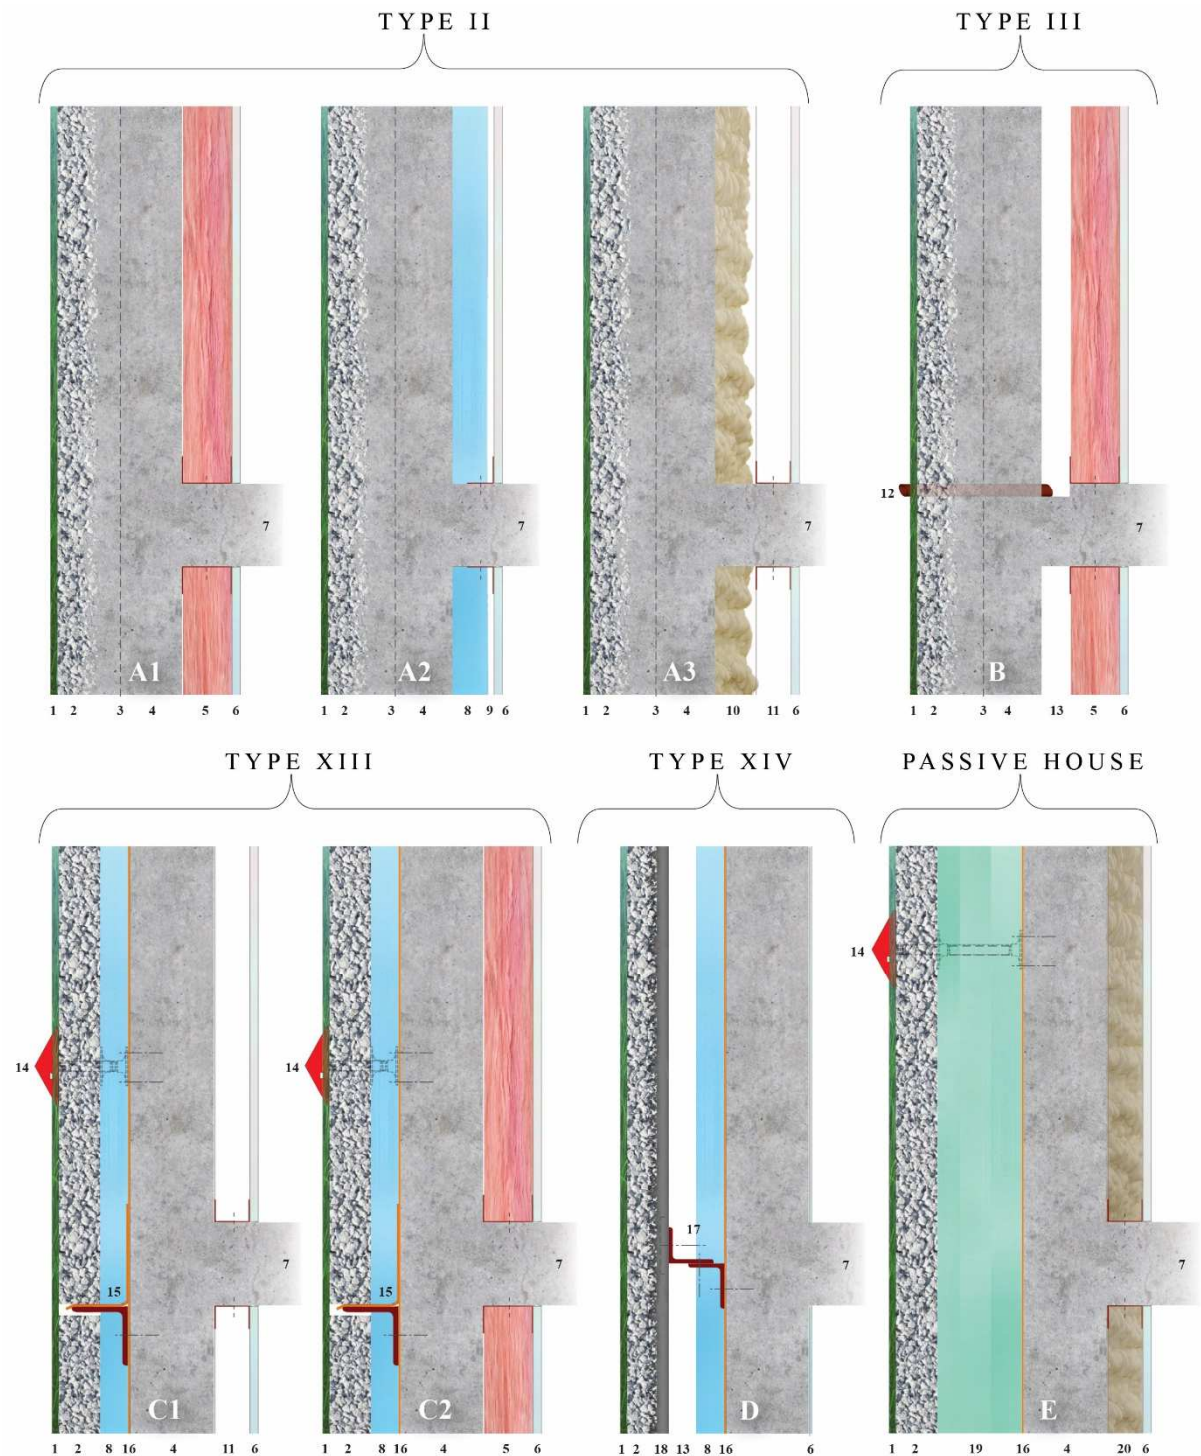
Generic wall type study: vertical wall section propositions. 1. Vegetation layer/drainage plane, 2. Pervious concrete/auxiliary drainage plane, 3. Welded wire fabric, 4. Normal strength or insulating concrete, 5. Thermal insulation – unfaced batts, spray-applied cellulose, or low-density spray-applied foam of an air-permeable water sensitive cavity insulation (can dry inwards/through interior finish); because air-permeable this wall assembly is not for cold, very-cold, subarctic, and arctic hygro-thermal regions, 6. Gypsum wall board (or
